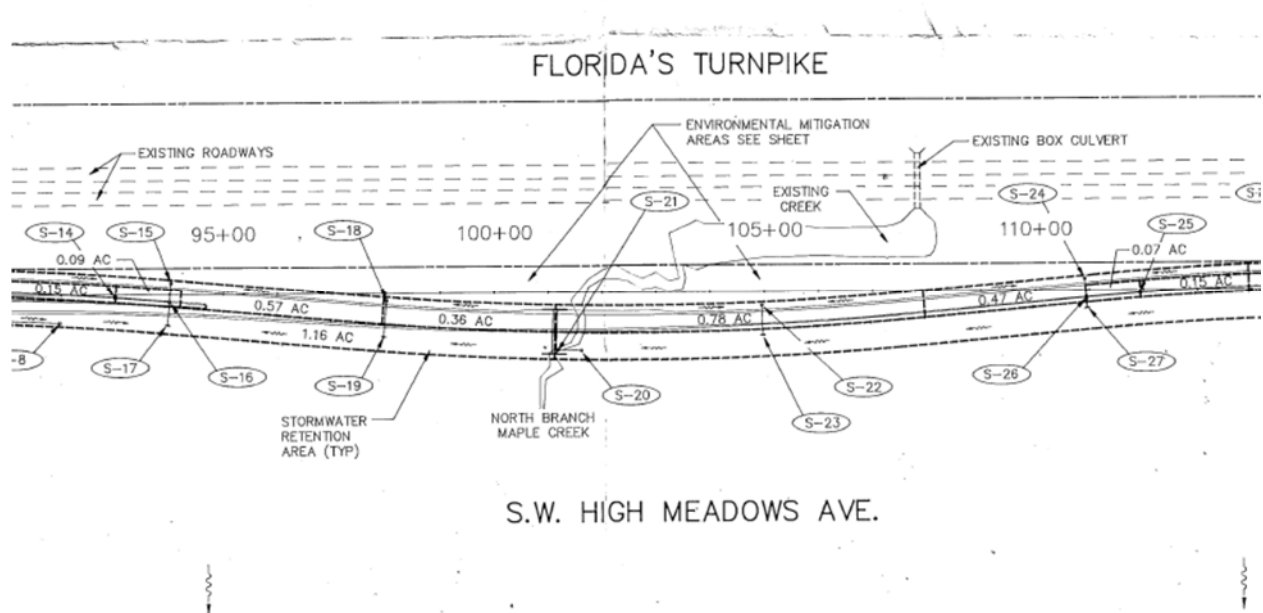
Plan/Profile Drainage Structure 6.1-2 - 1955 plans
